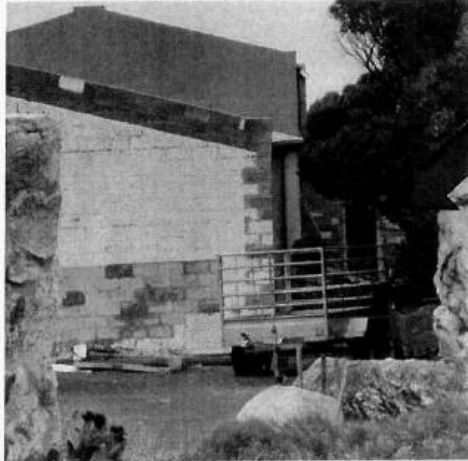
The proposed "boiler room" (doorway seen on the right in this photo) is shown on the distillery plan as a proposed future build but has already been built.
